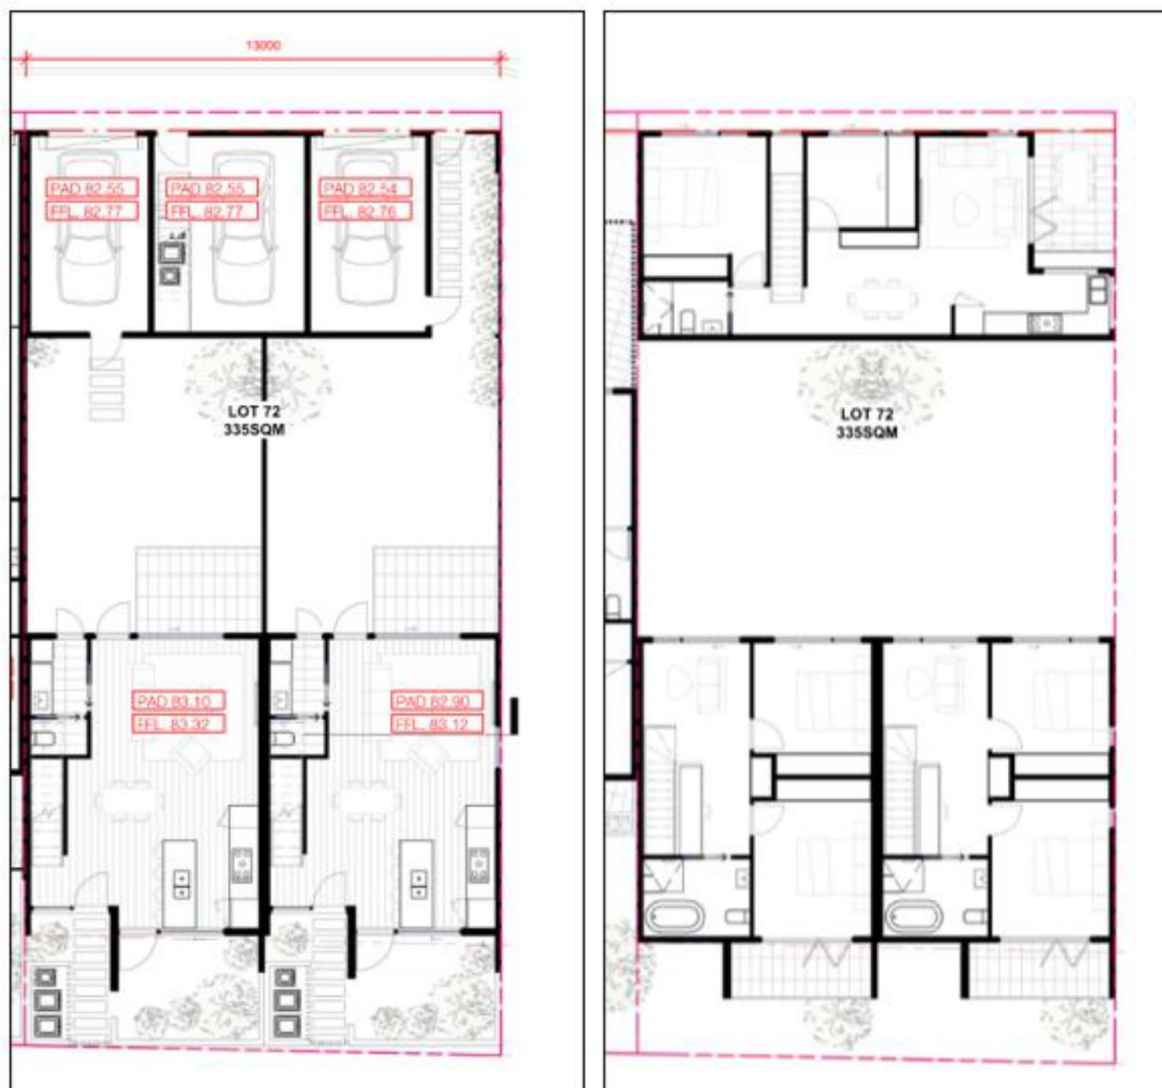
Example MDH layout with studio dwelling. GF (left) & FF (right)
